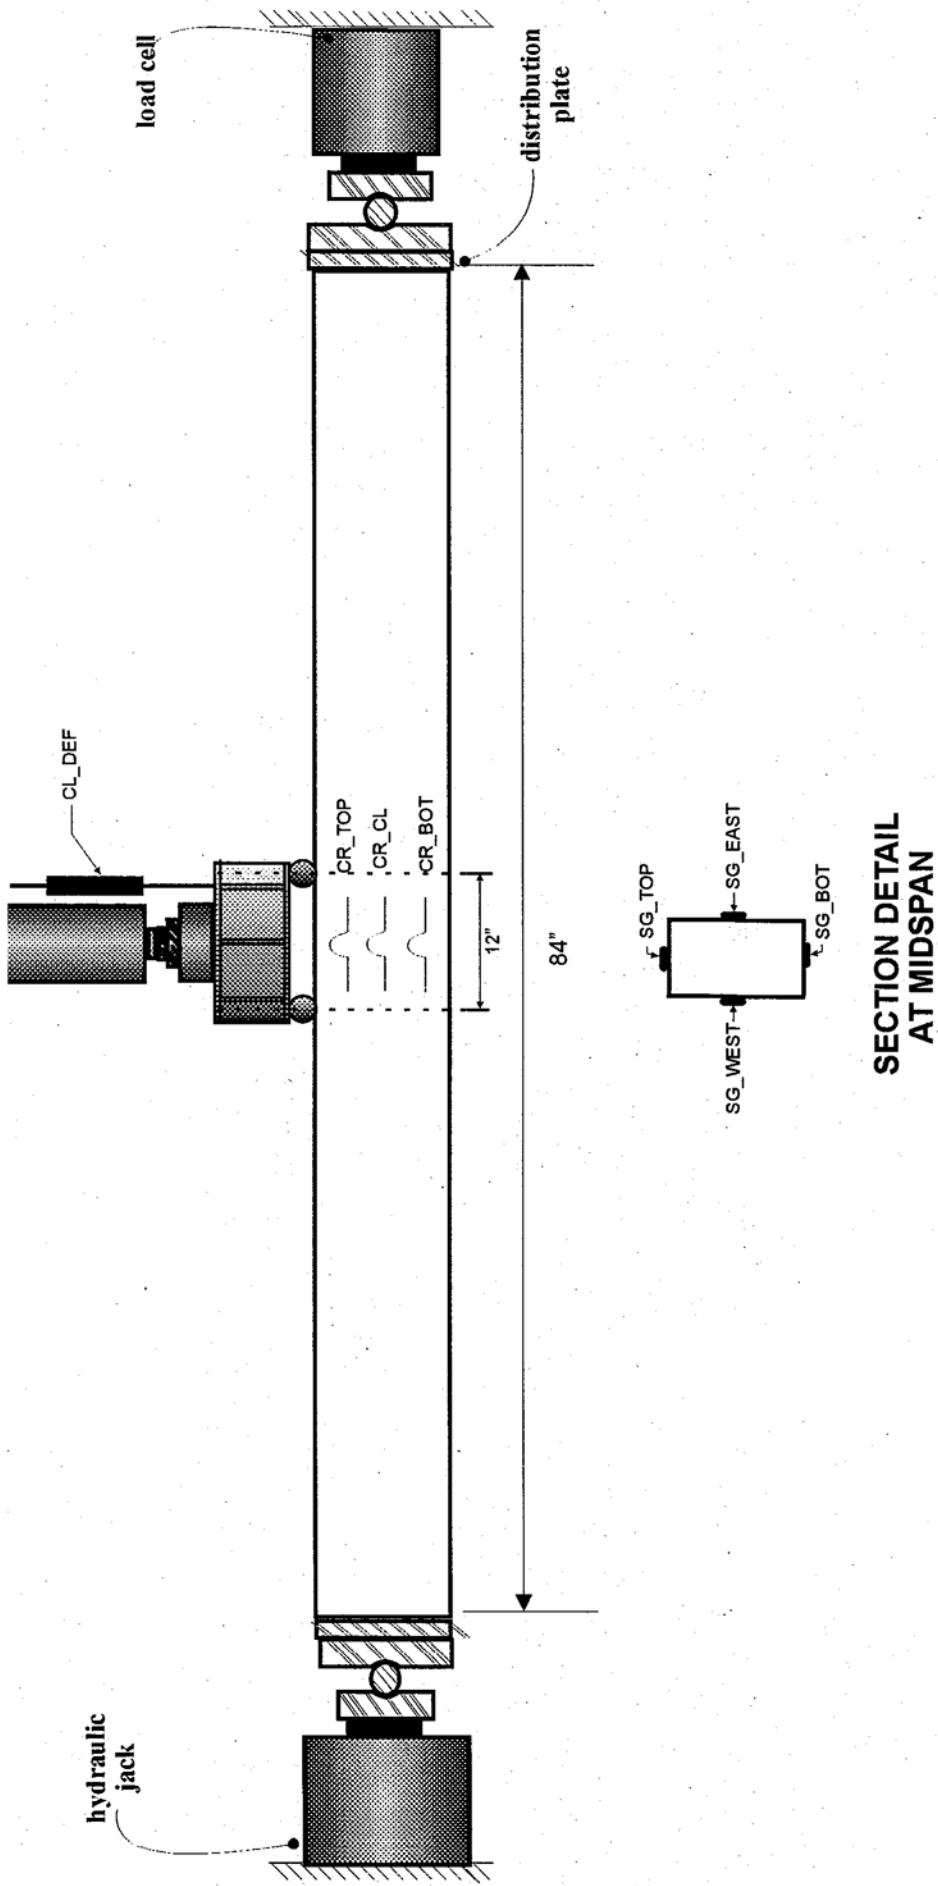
(c) Instrumentation Detail of Specimen Without Corbels For Pure Compression
